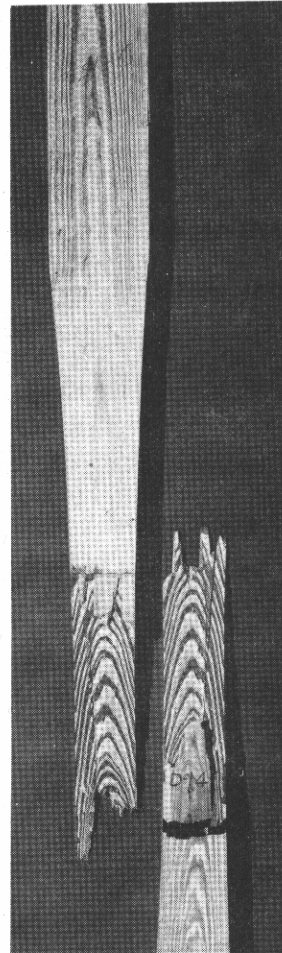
Test failure of nominal 2-by 6-inch scarf-jointed specimen necked down to 3-1/2-inch width.
